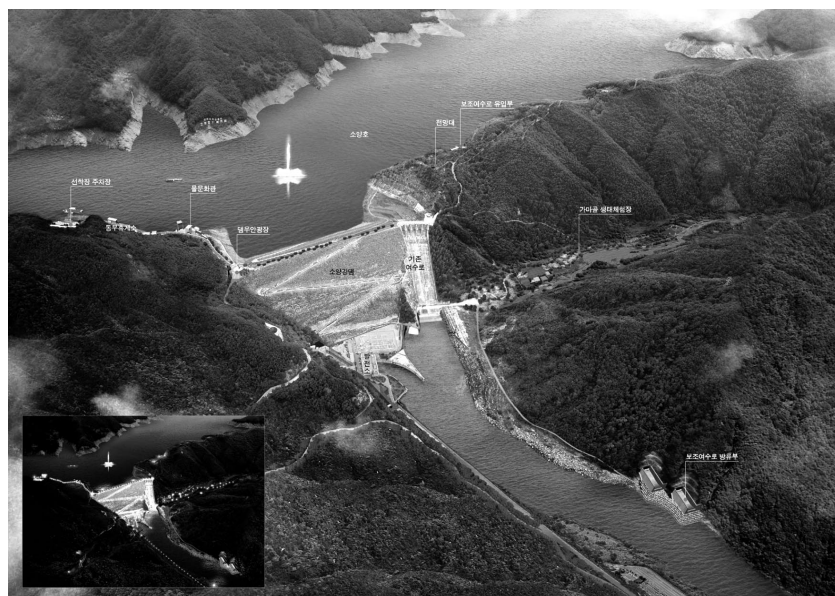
Bird's-eye view of Soyonggang Dam after construction of auxiliary spillway
